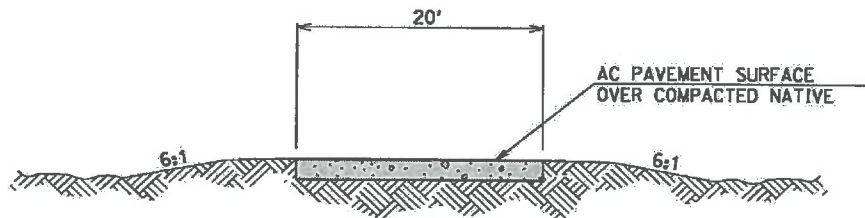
Alternate Spine Road Cross Sections
